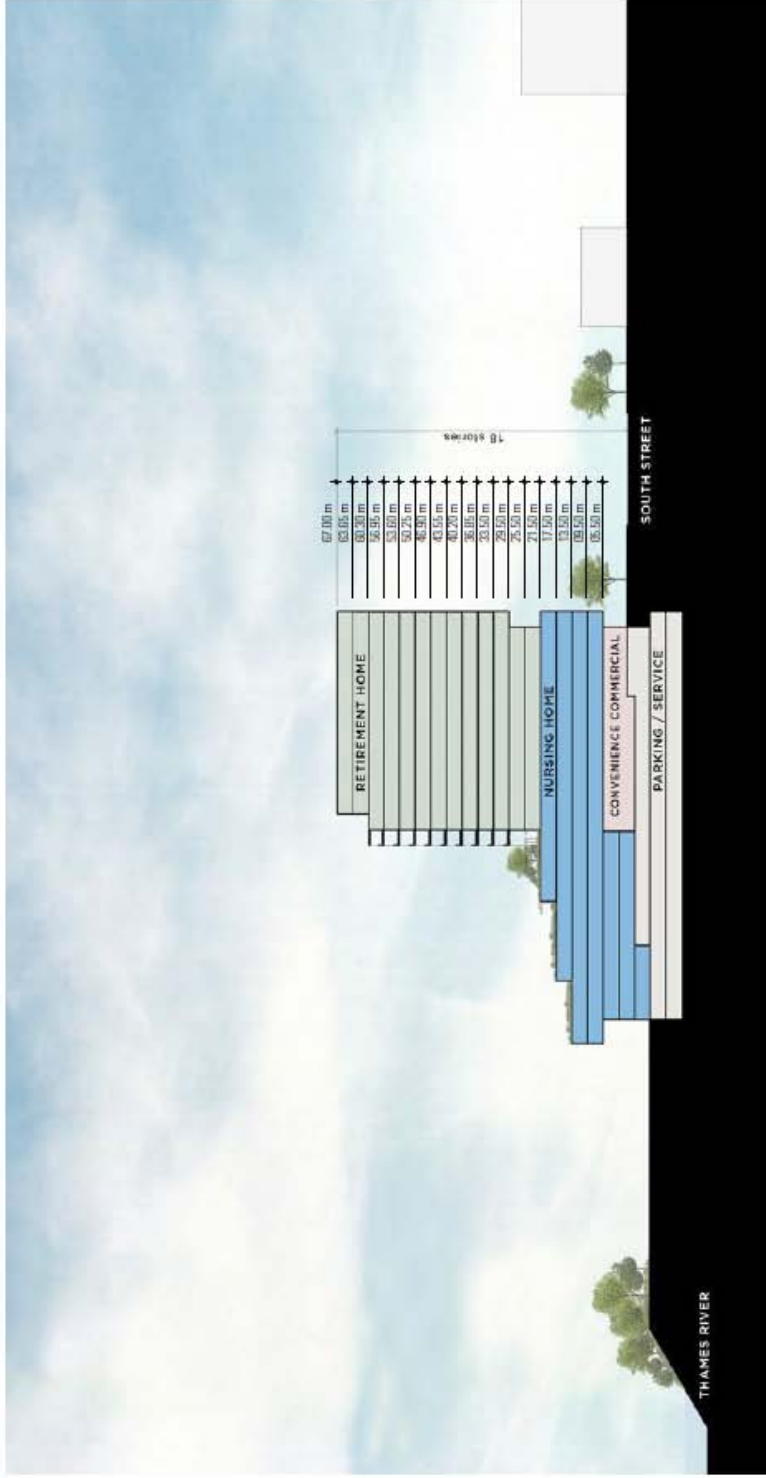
02 Site Section Through Senior Condo Tower and Convalescence Centre
